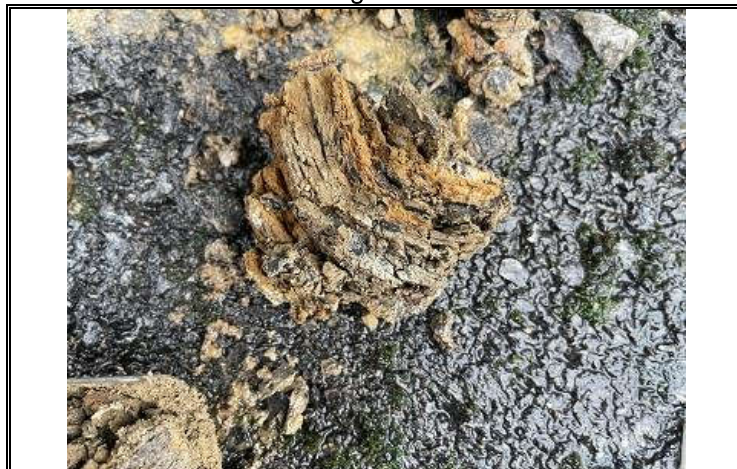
/1057/R3/P18 – Window Sample WS2 – Drilling core at 1.6m bgl – Very stiff weathered Mudstone.
